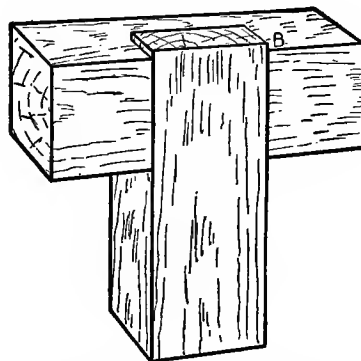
Lap Joint Parts Put Together, Showing Projecting End (B)
